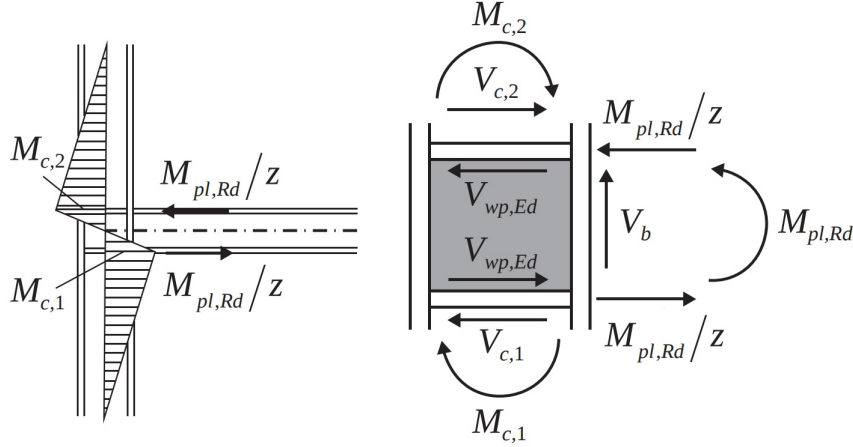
Forces acting on the column web panel. Source: Landolfo et al. [35]
